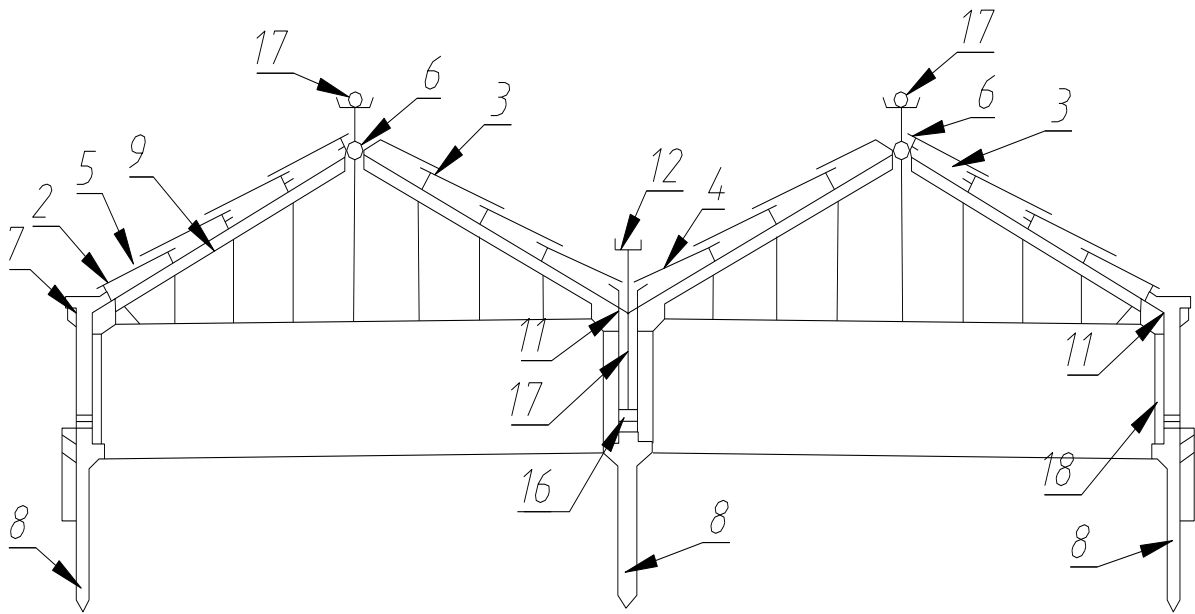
Frame of load-bearing structures of a multi-span building:
